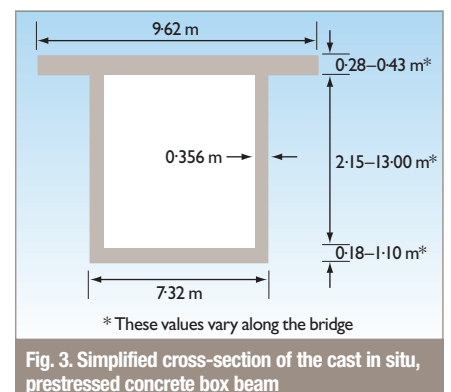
Simplified cross-section of the cast in situ, prestressed concrete box beam
